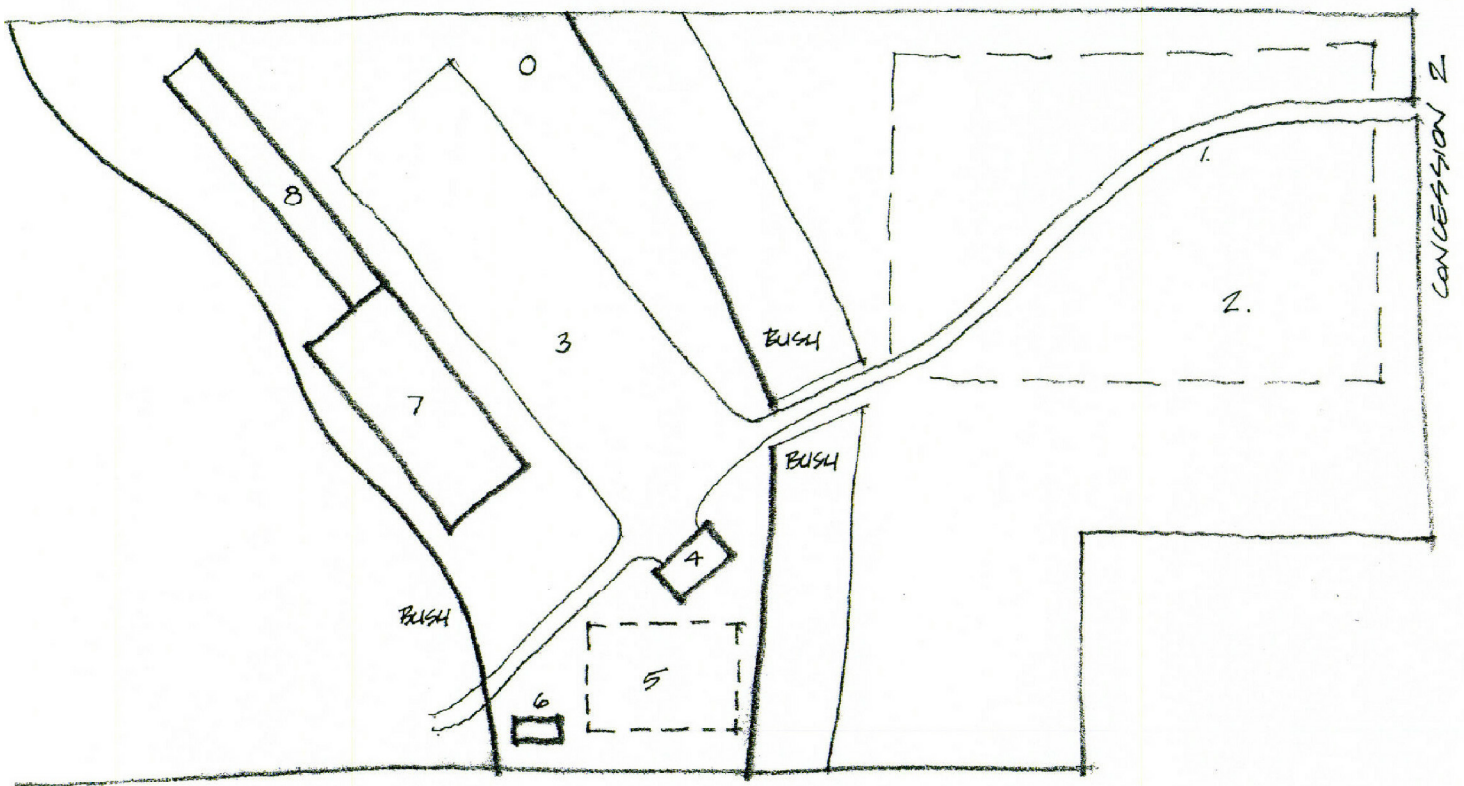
LOCATION PLAN LOT 13, CON. 2 EGR, (GLENELG) MUNICIPALITY OF WEST GREY
